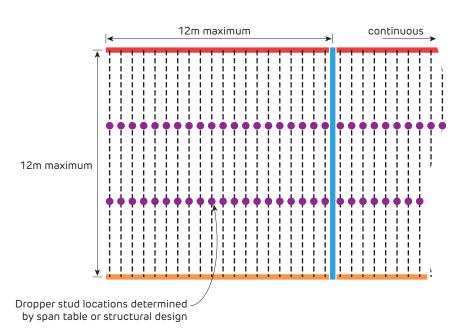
Stud Ceiling Type A4 - Fixed / Sliding
